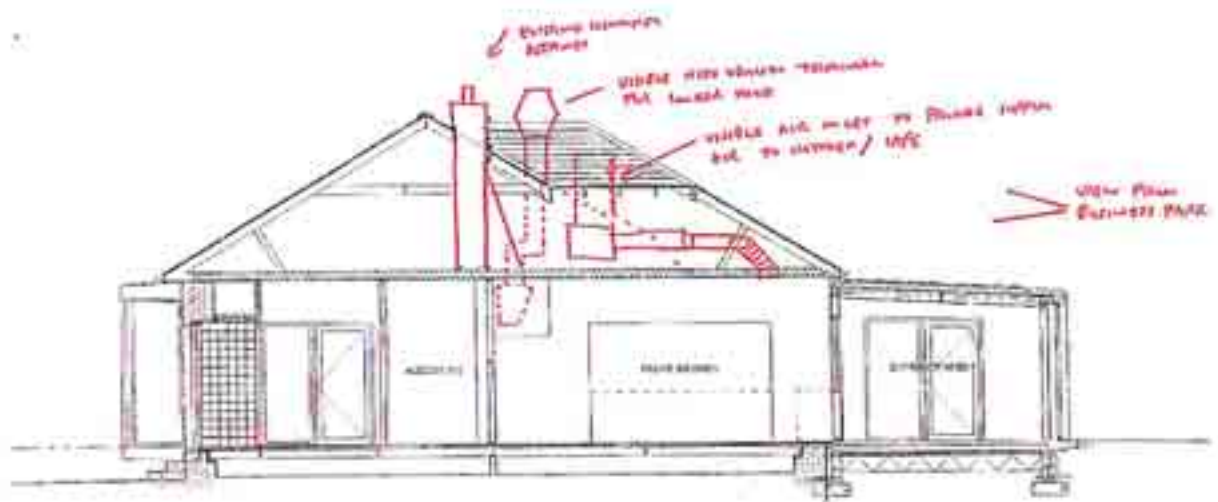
Section showing unsightly alternative of mechanical extraction and air inlet through roof
